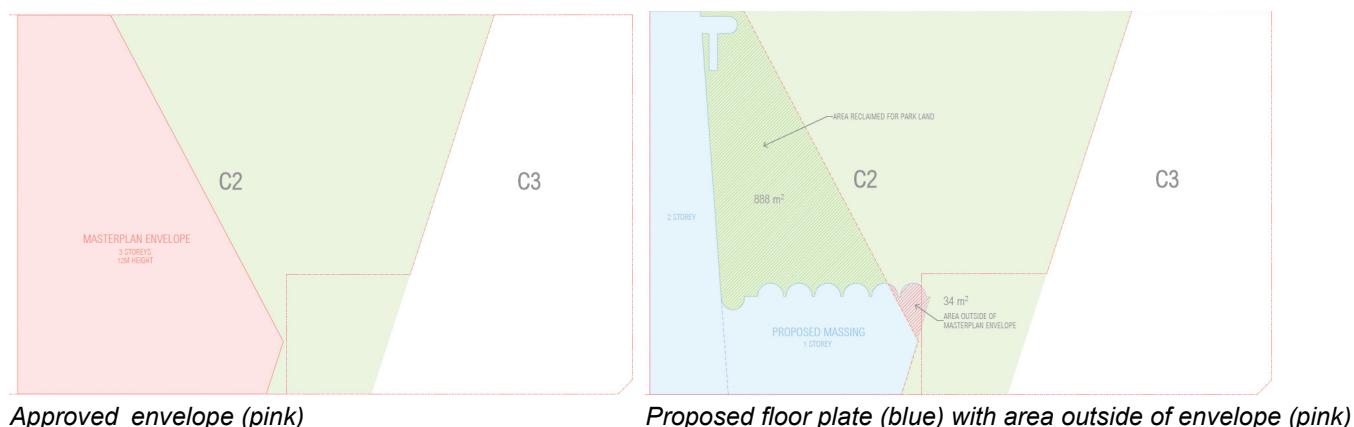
Plan comparing the approved envelope to the proposed Building C2 floorplate
